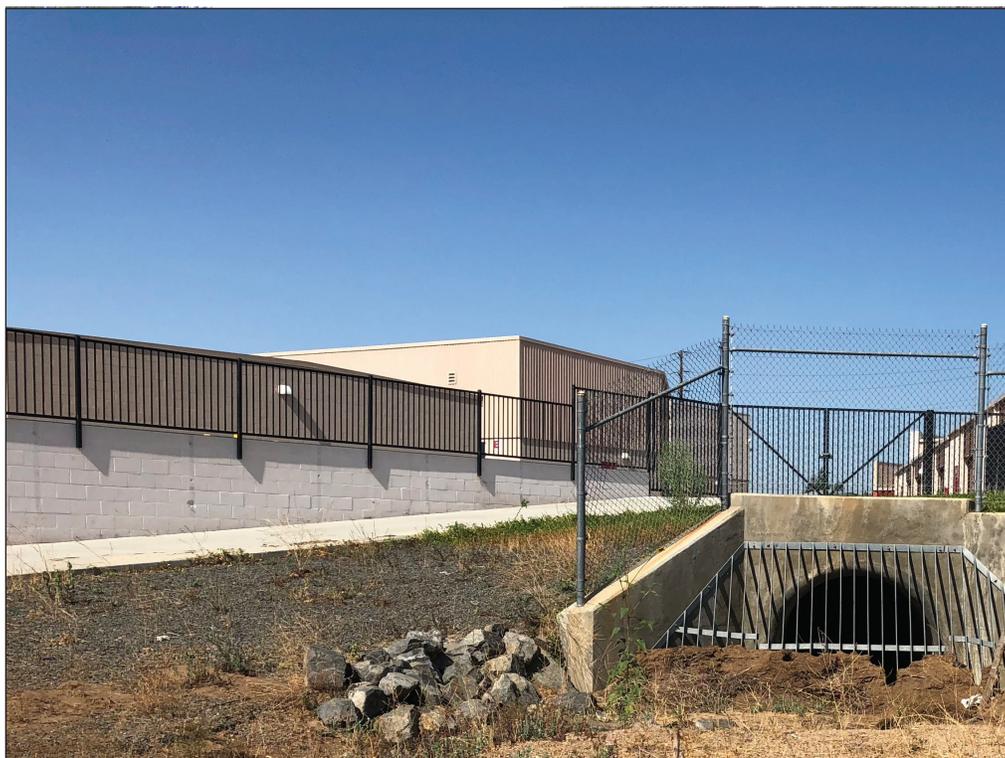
Culvert with headwall where drainage terminates. Facing southwest (downstream).
